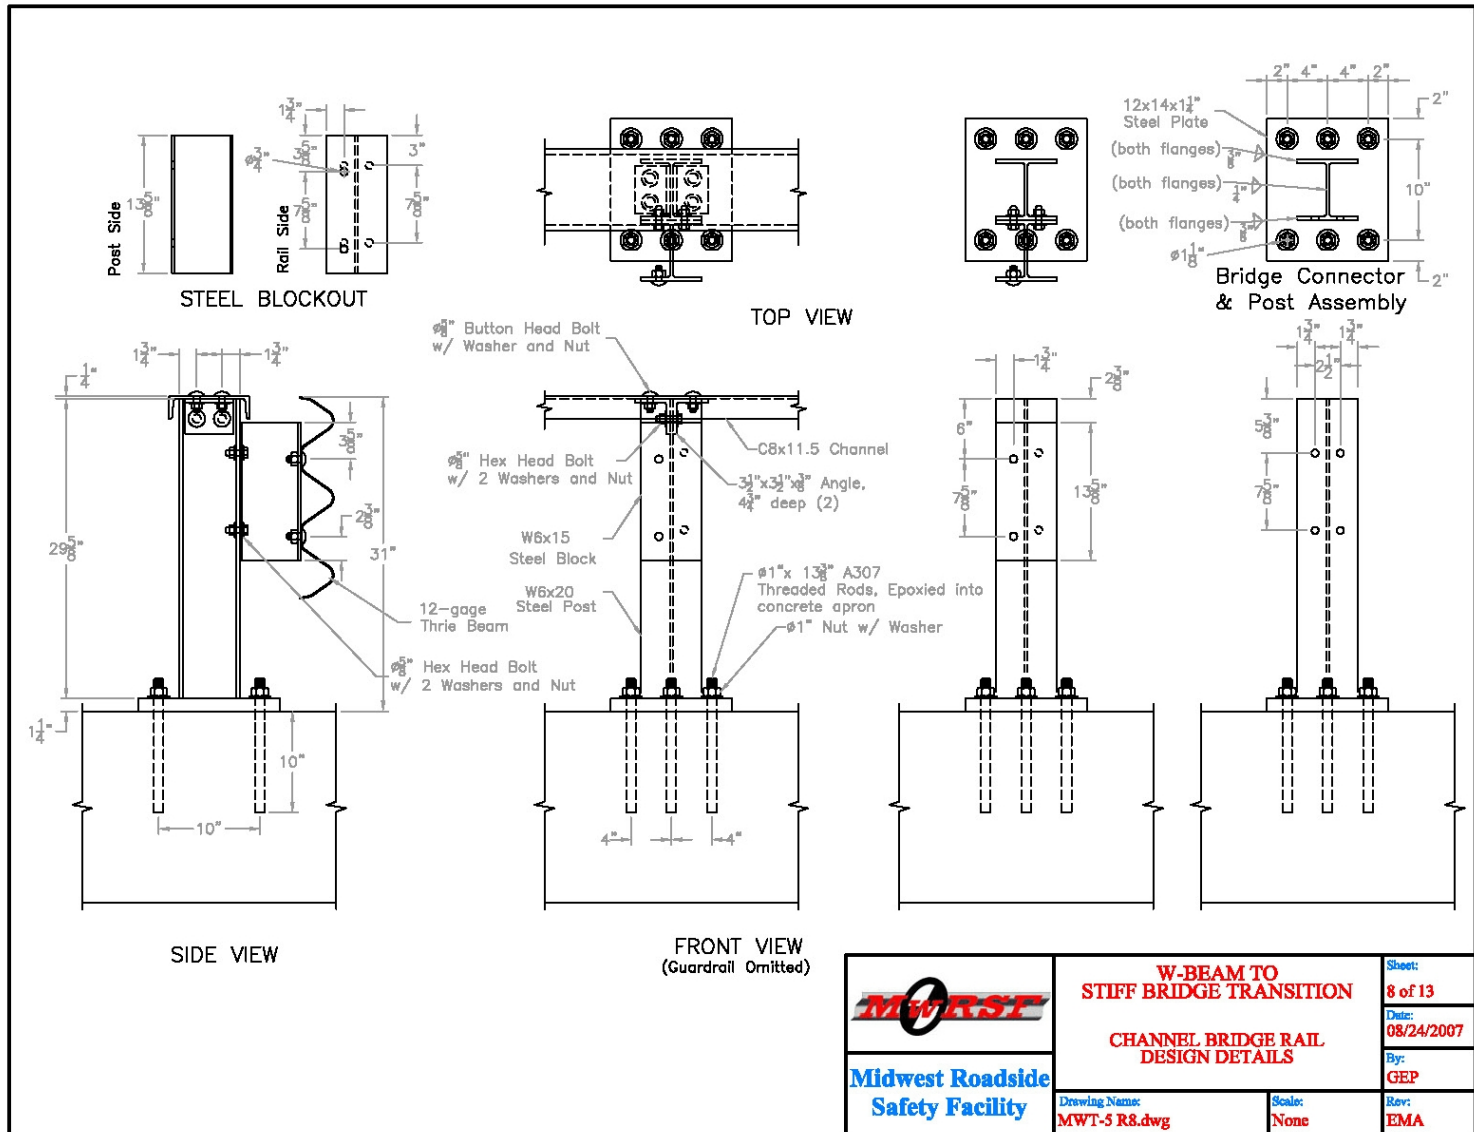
Channel Bridge Rail Design Details, Design No. 3 (English)
